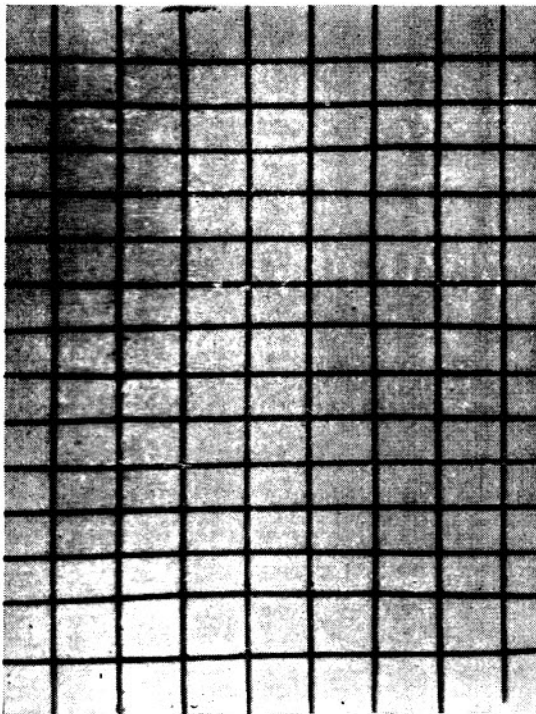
Frame work of mild-steel rods welded at 2' x 3' centering.
